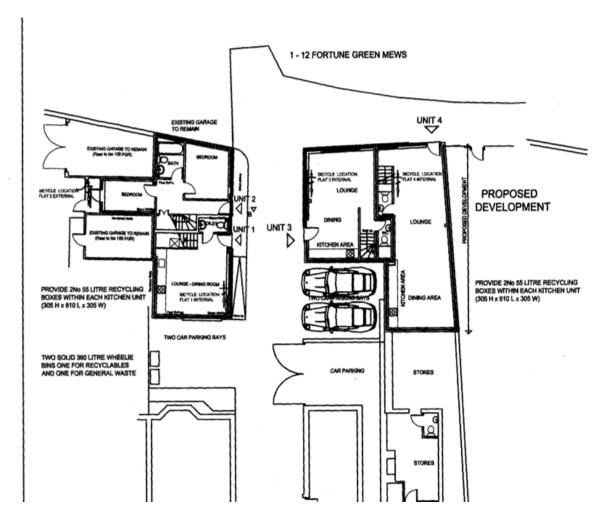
Extract from the approved plans for the original development showing the general layout, access and parking arrangements
